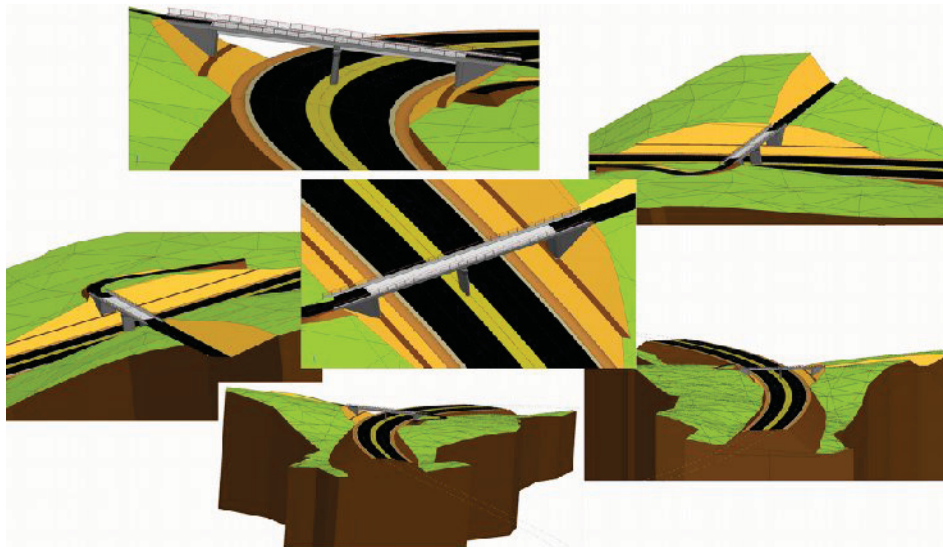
Parametric 3D model of a construction site (Günthner and Borrmann, 2011)
